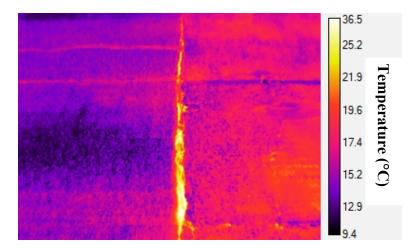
Asphalt and concrete pavement surface temperatures at 9:30 a.m.
